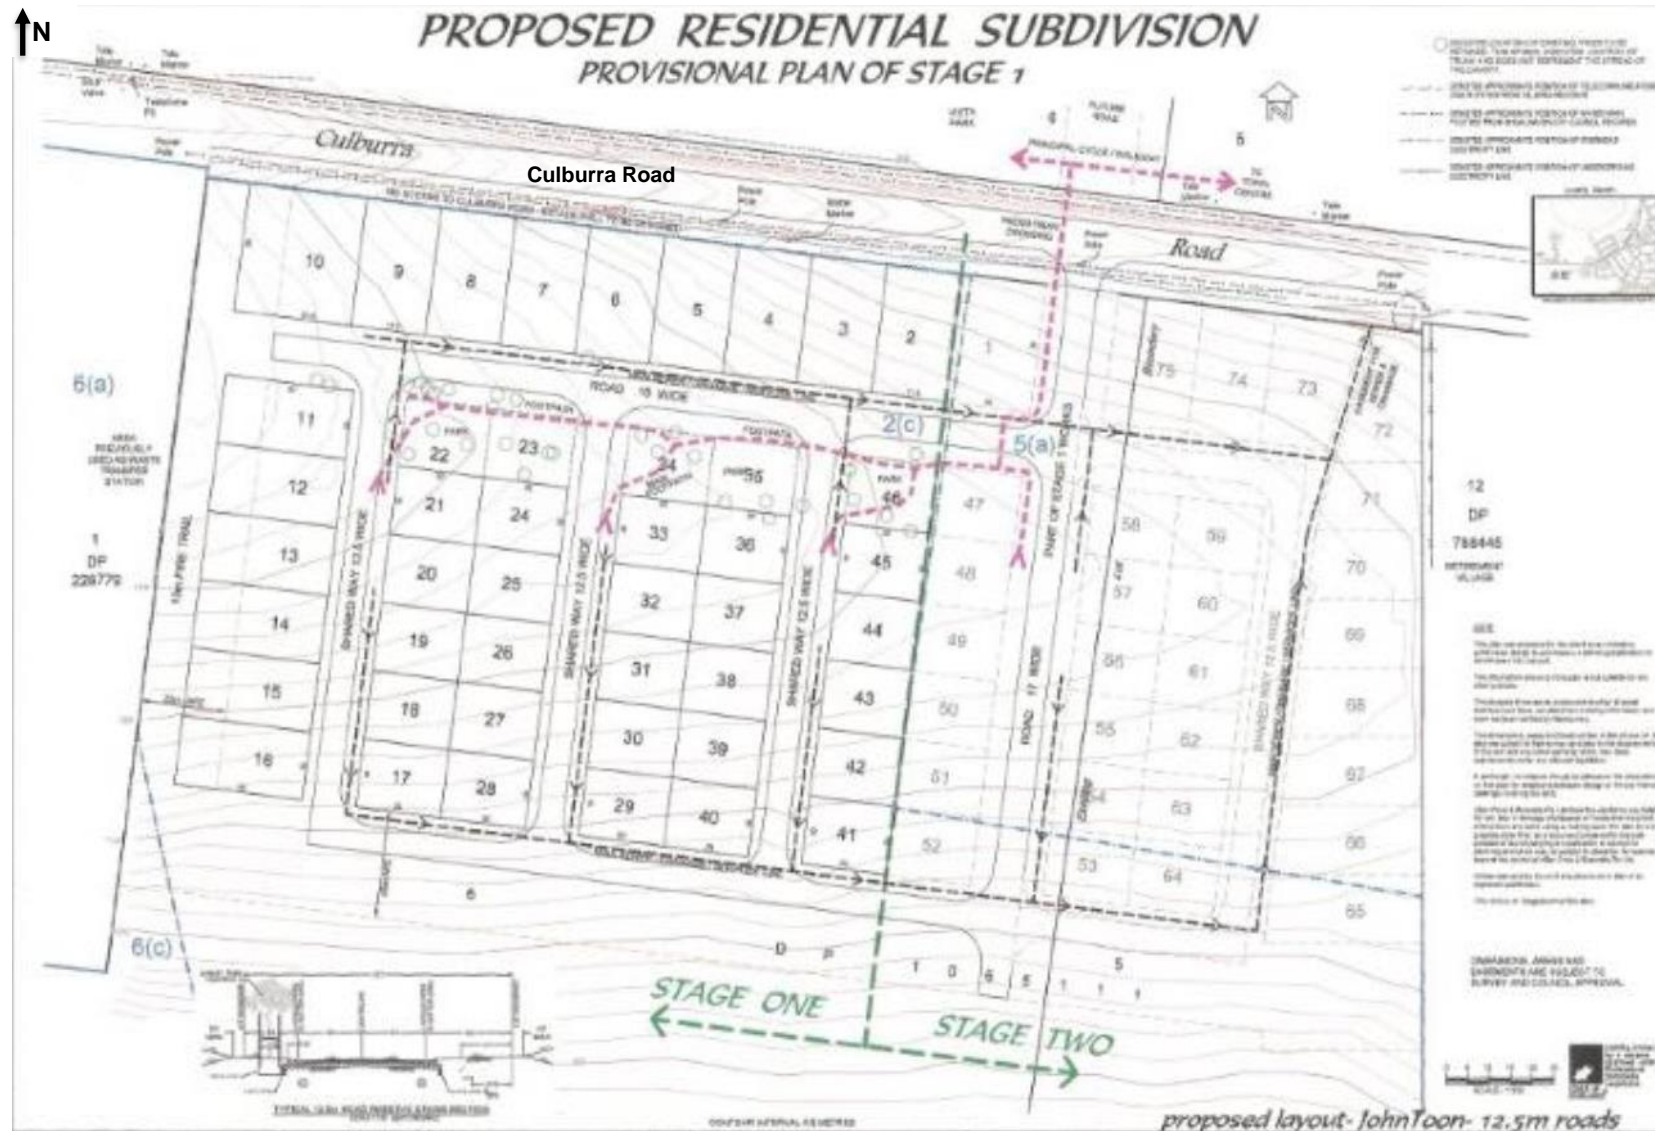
Stage 1 Residential Development south of Culburra Road (referred to as Site B in Figure 6)
